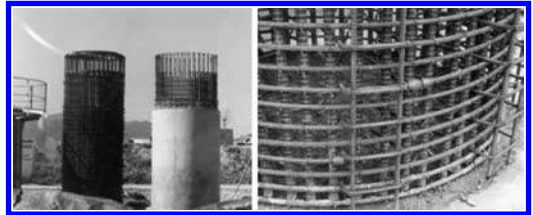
Seismically over-designed piers and corresponding arrangement of reinforcing bars.
